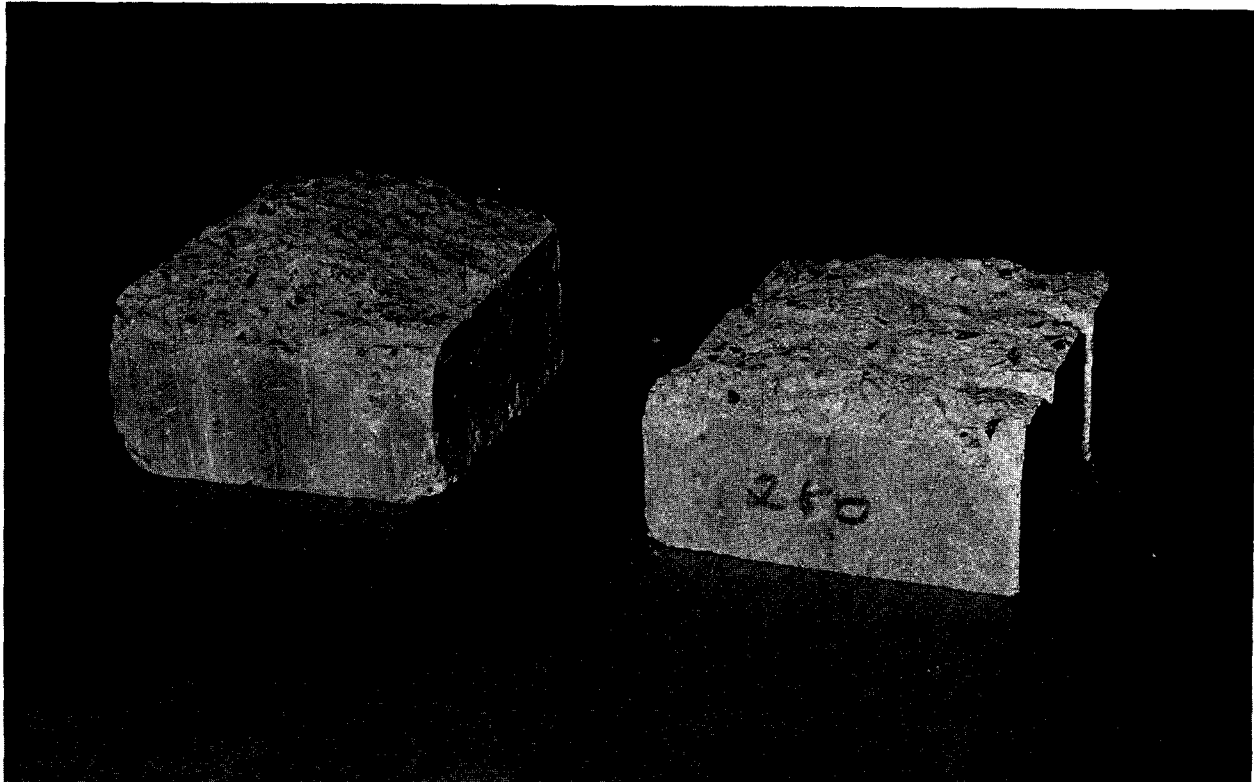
Flexure testing of sulfur concrete beams. Left, modified sulfur concrete; right, unmodified sulfur concrete.
